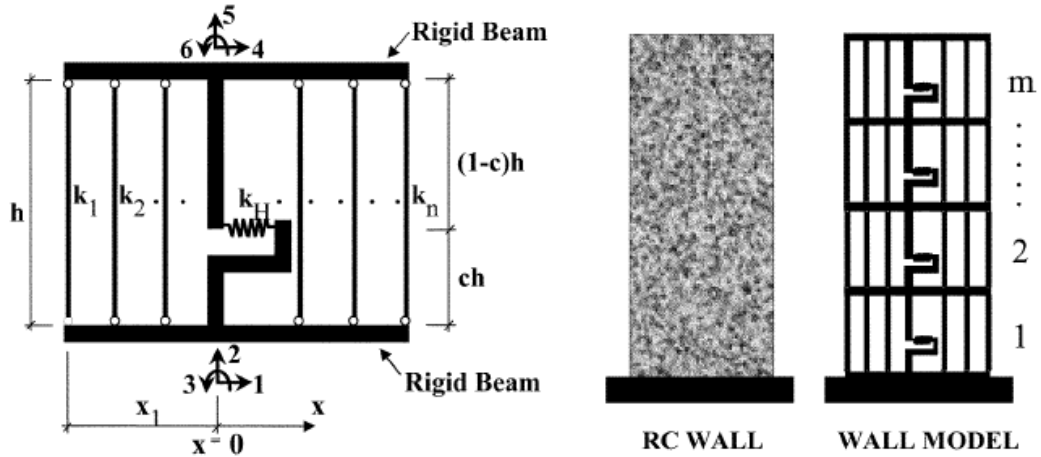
Typical MVLEM element and wall model (Orakcal, 2004)
